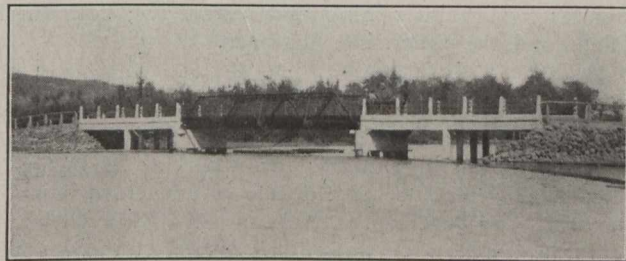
Steel Bridge with Reinforced Concrete Trestle Approaches, all Supported on Concrete Piles.
